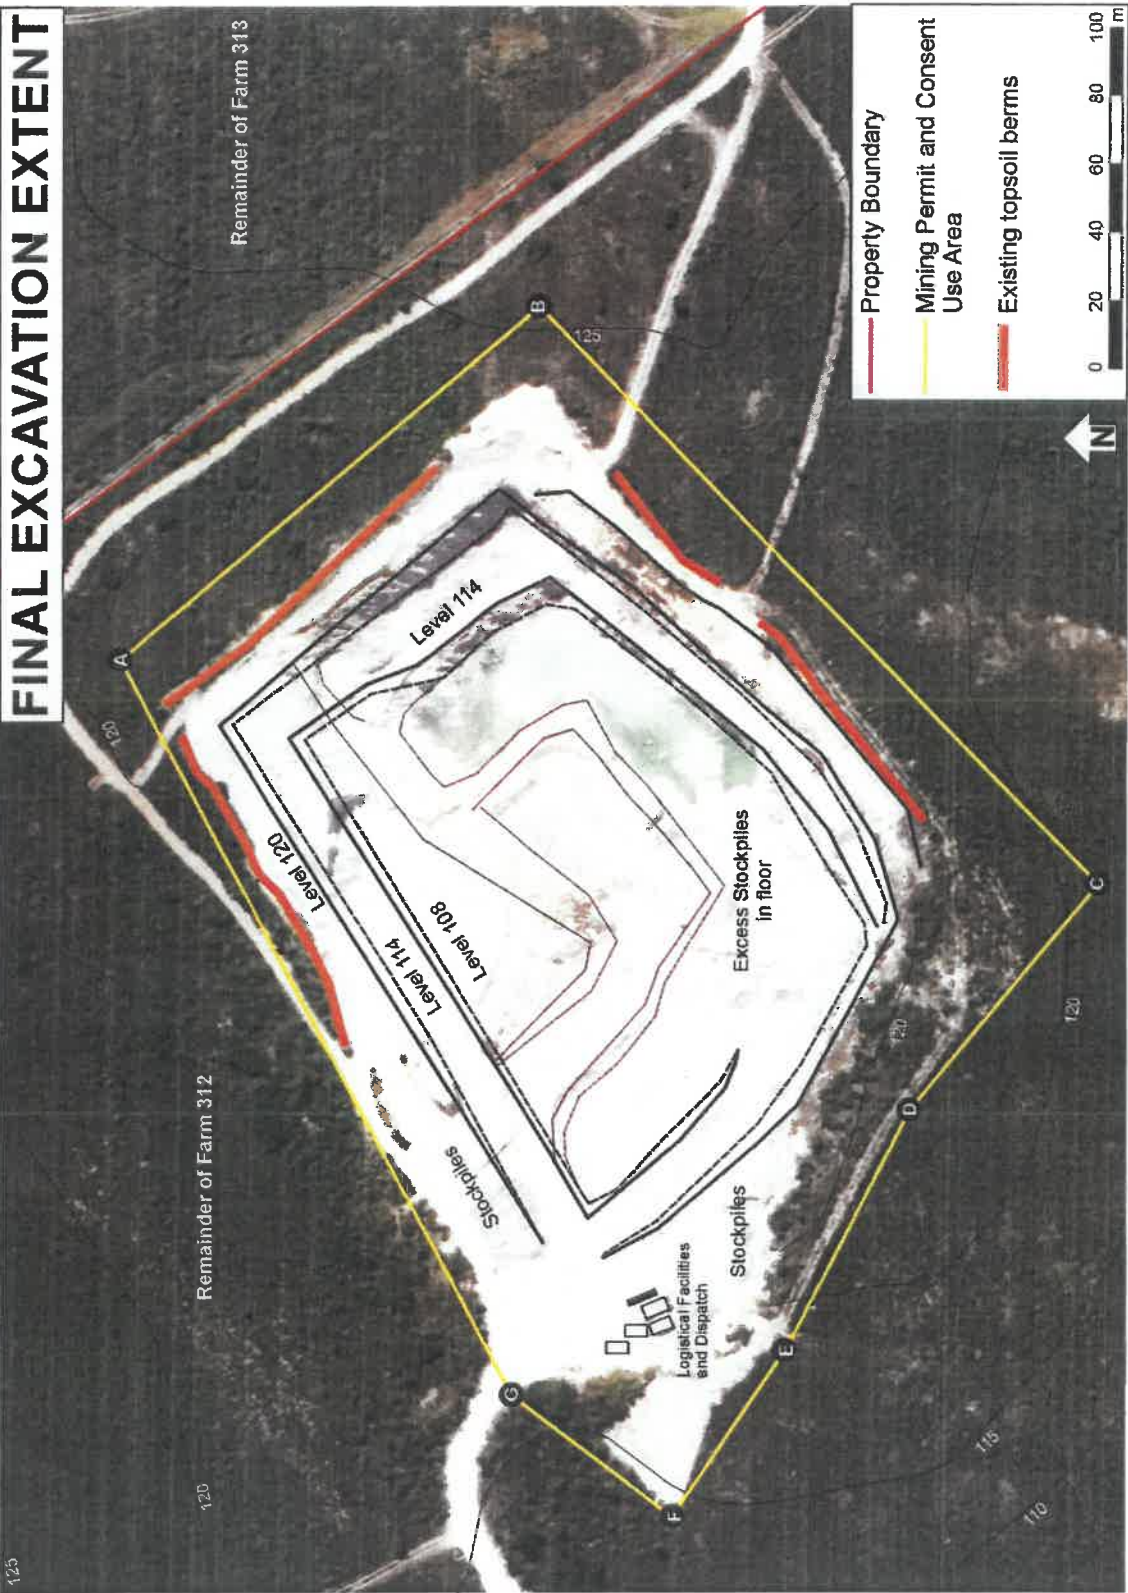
Quarry Layout Plan: Final Extent of Excavation
